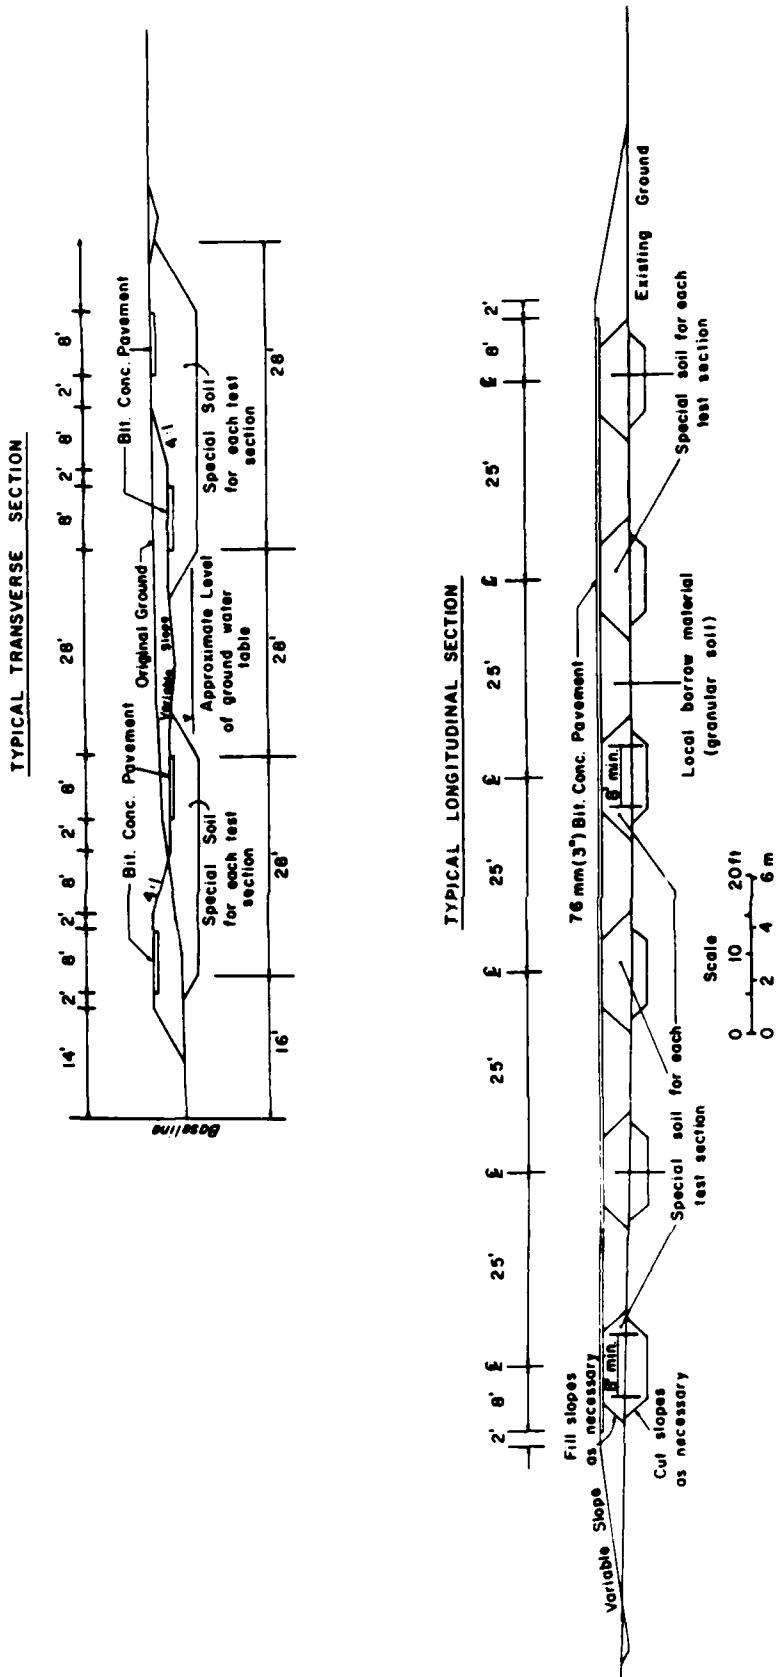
Transverse and longitudinal sections, Winchendon test site.
